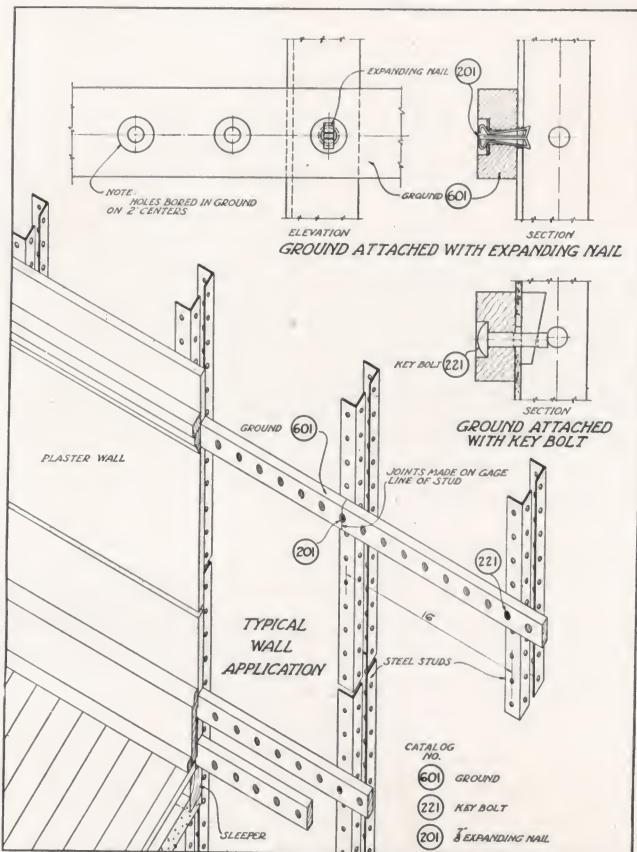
Wood Grounds Drilled on 2-in. Centers Provided for the Rapid and Easy Attachment of All Types of Wood Trim
